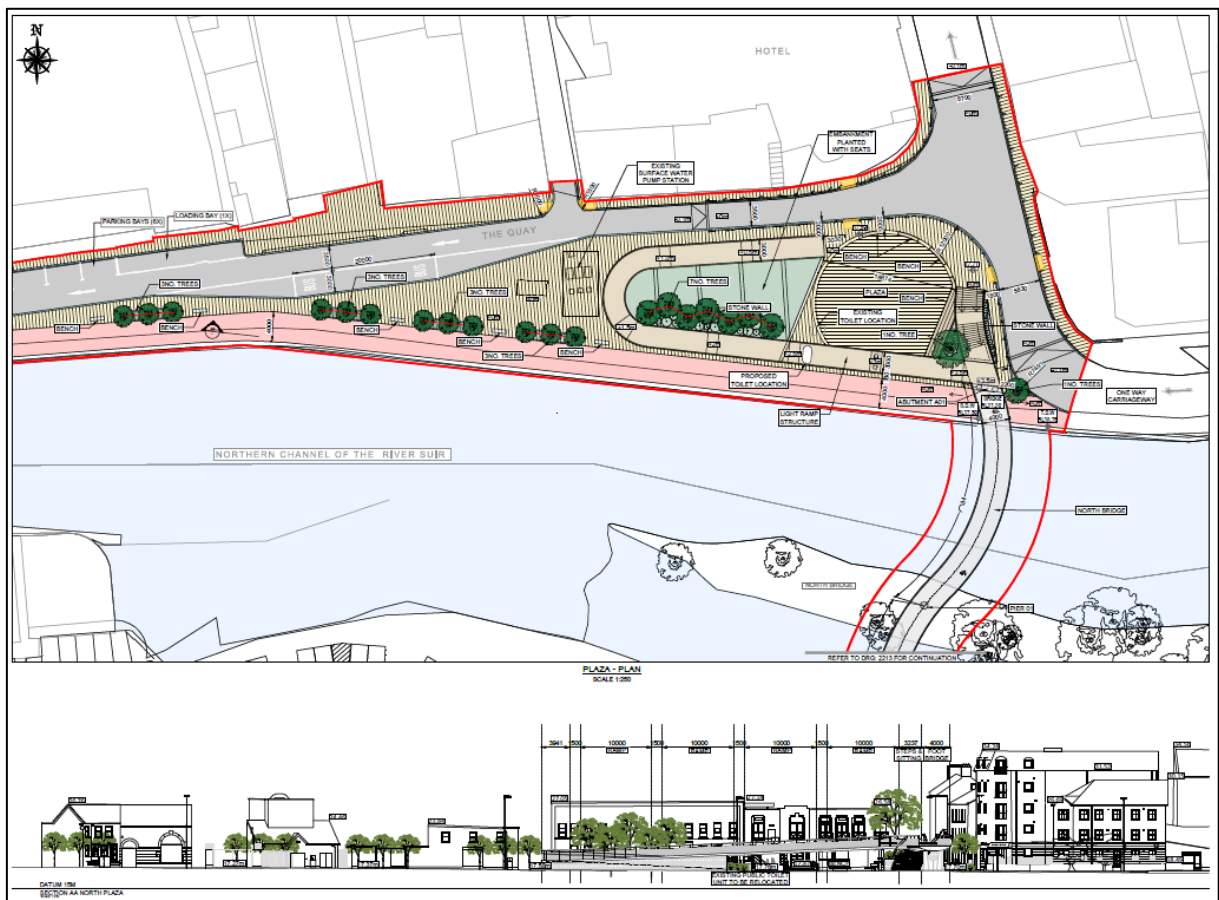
The proposed development areas as detail drawing area showing proposed architectural and landscape design scheme of the northern bridge, associated ramp, steps, plaza and landscape.
